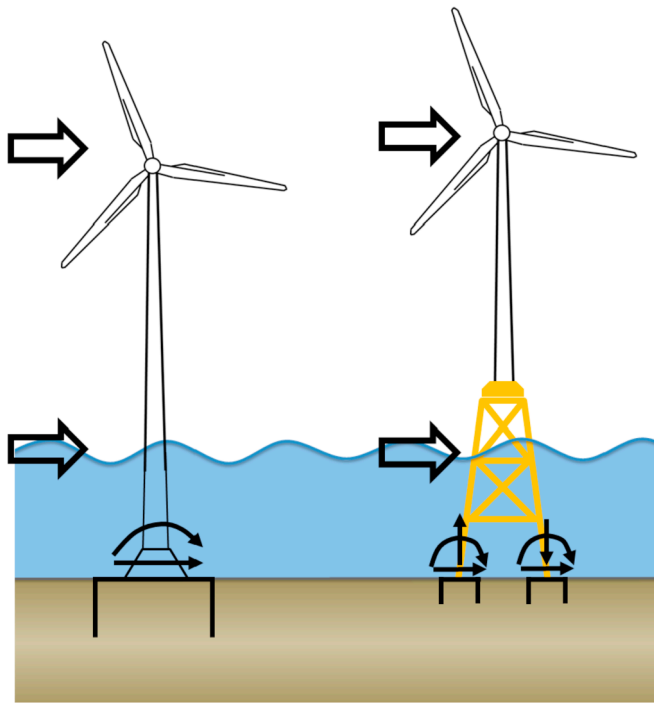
Loads on caisson foundations supporting a) a mono tower and b) a jacket.
